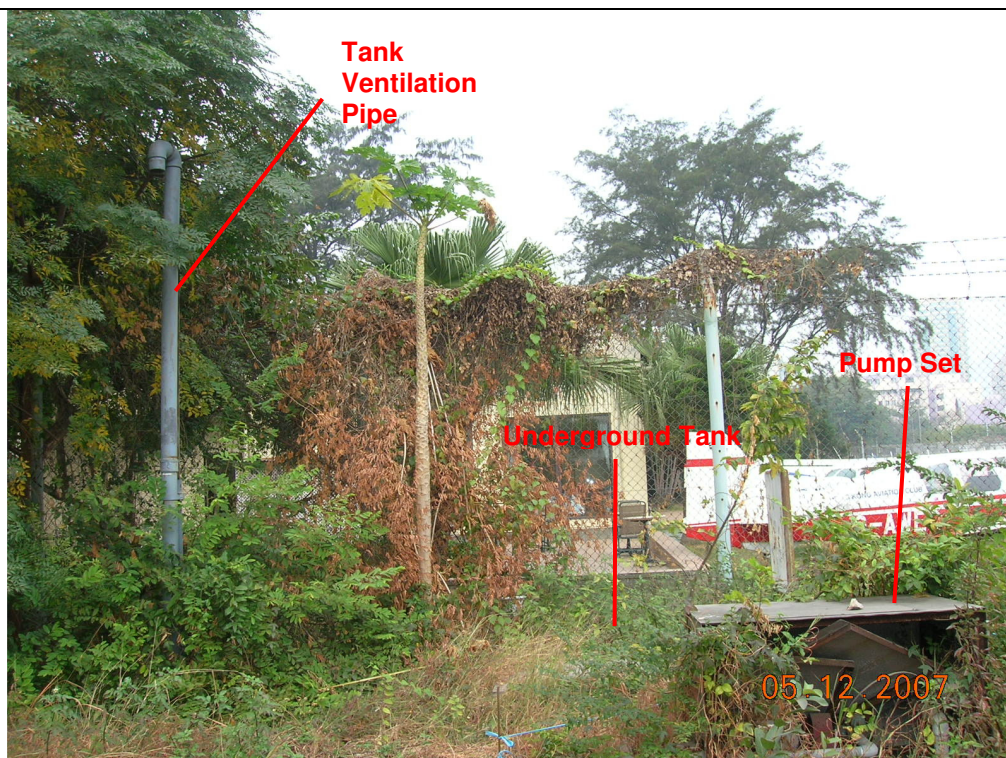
Location of Tank Ventilation Pipe, Underground Tank and Pump set.
